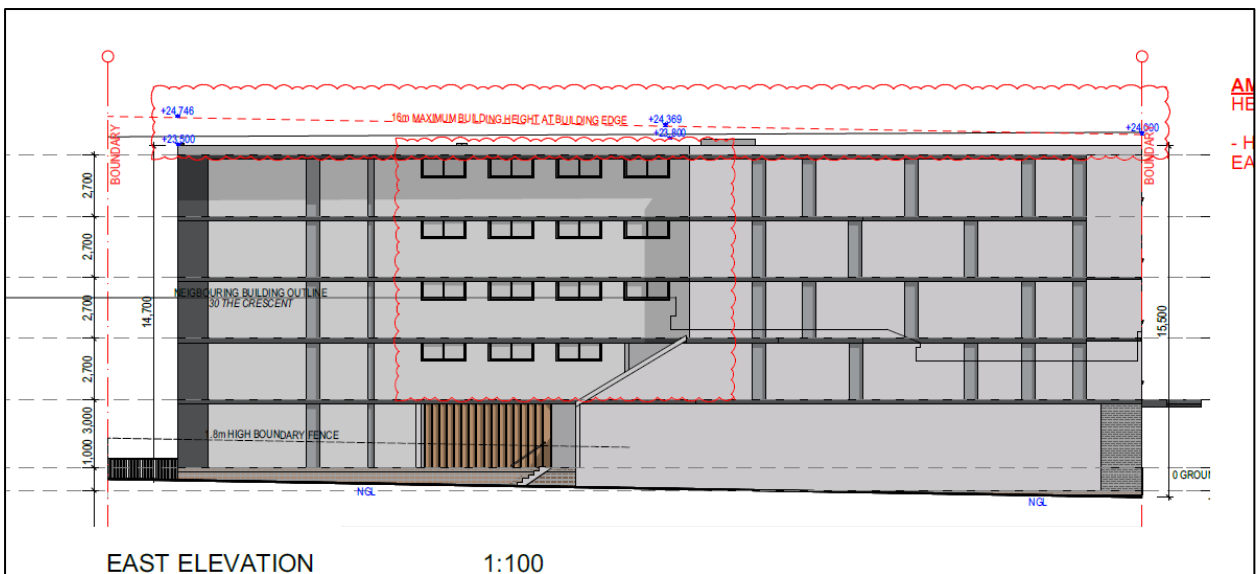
Approved East Elevation – DA 2018/67/1 (dated 1 March 2019)
